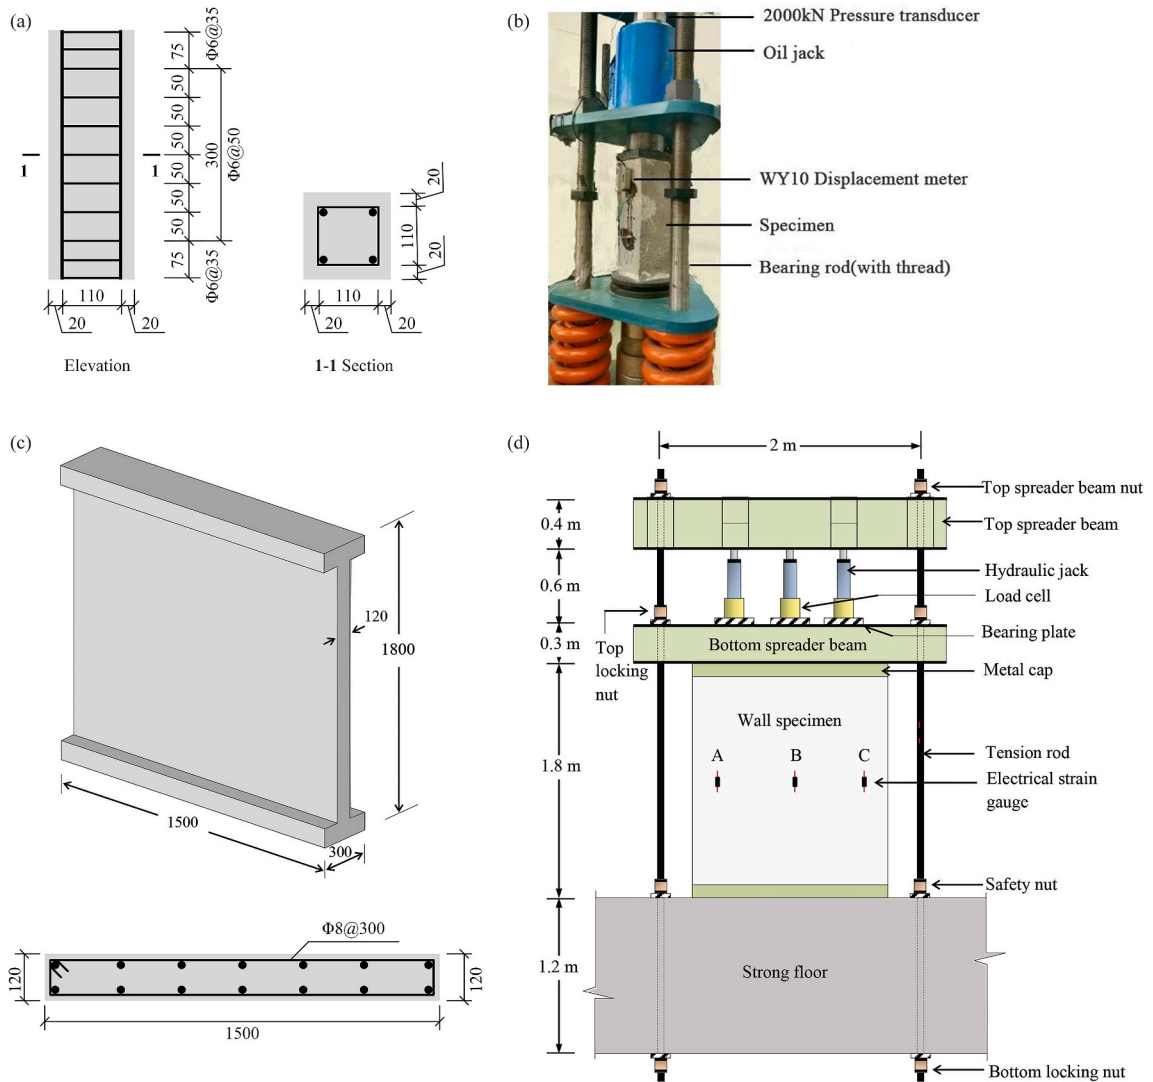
Detailed information and loading arrangements of specimens: (a) Dimensions and reinforcement details of the specimen in Ref. [51]; (b) Loading setup for the specimen in Ref. [50]; (c) Dimensions and reinforcement details of the specimen in Ref. [50]; (d) Loading setup for the specimen in Ref. [50].
